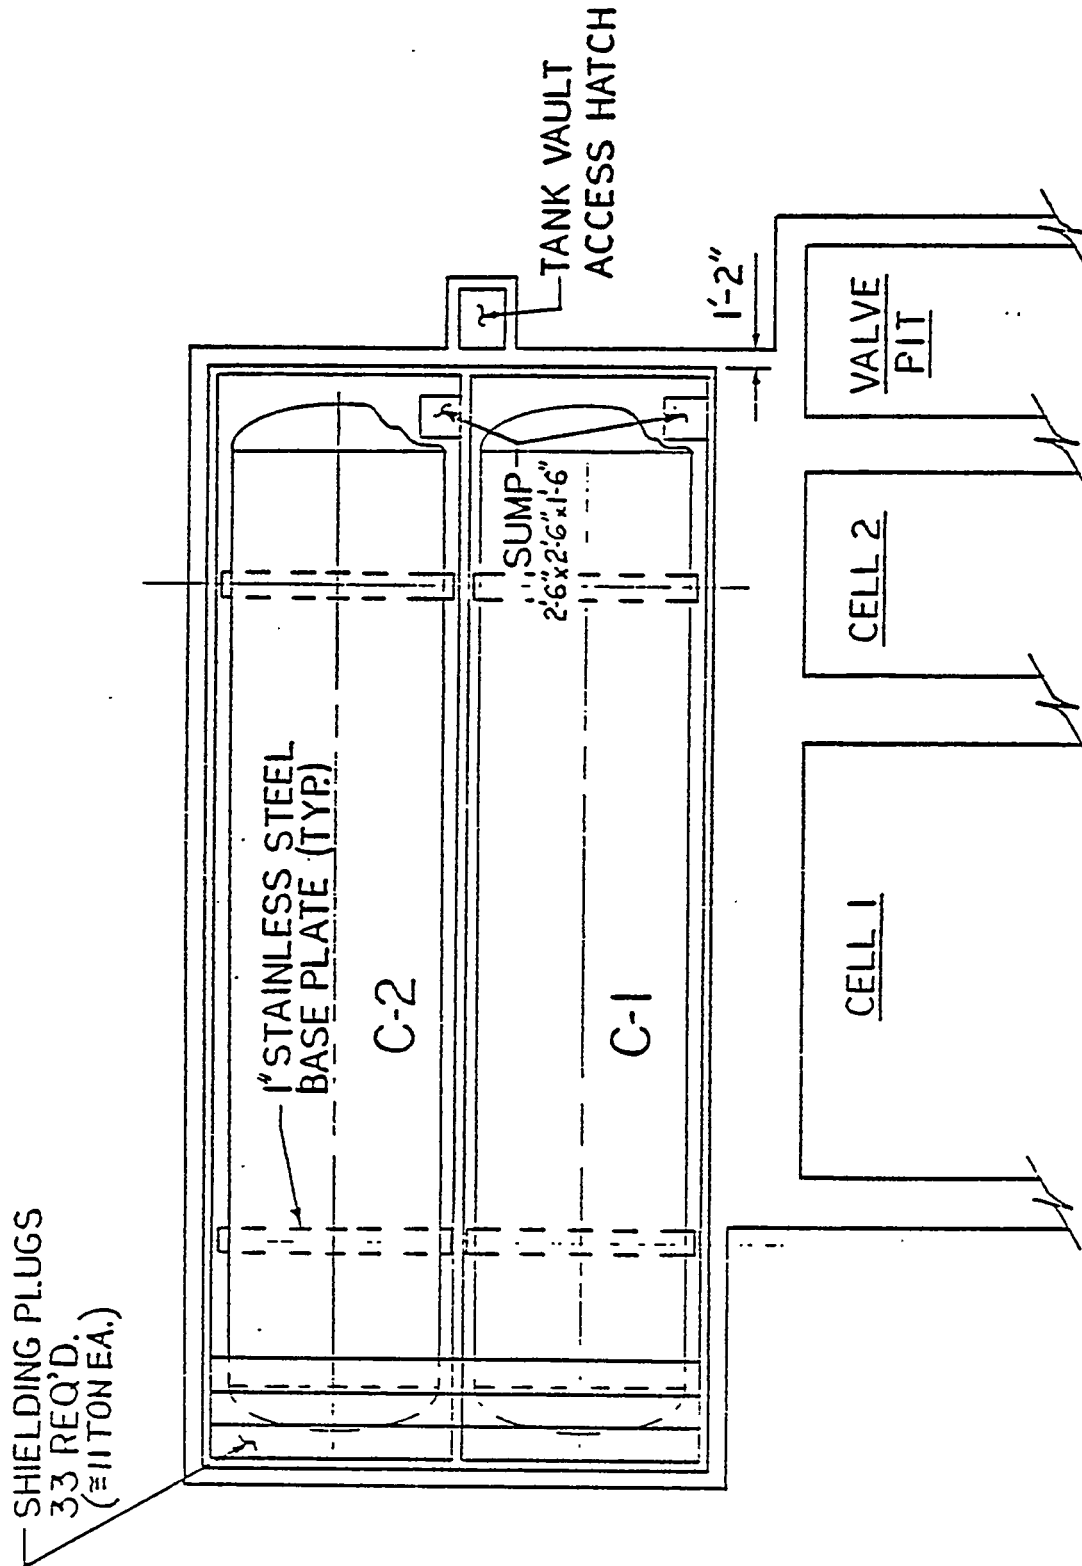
HLW STORAGE TANK VAULT PLAN (Binford and Orfi, 1978)
